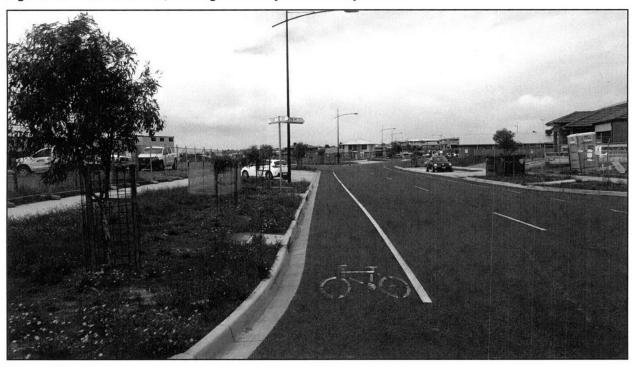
Fischer Street, looking north to and beyond the subject site
